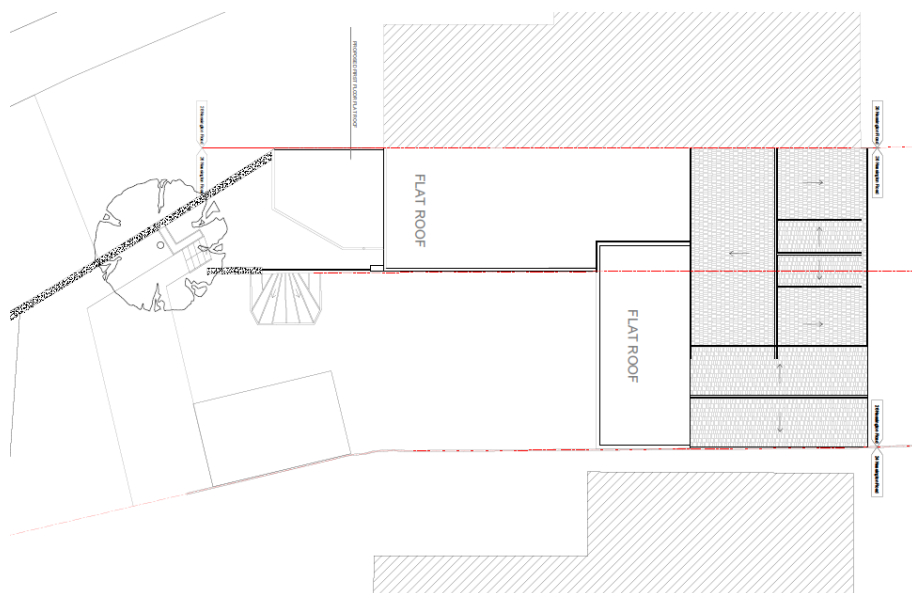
Plan demonstrating the flat roof of the extension alongside the existing rear back additions of the property.
